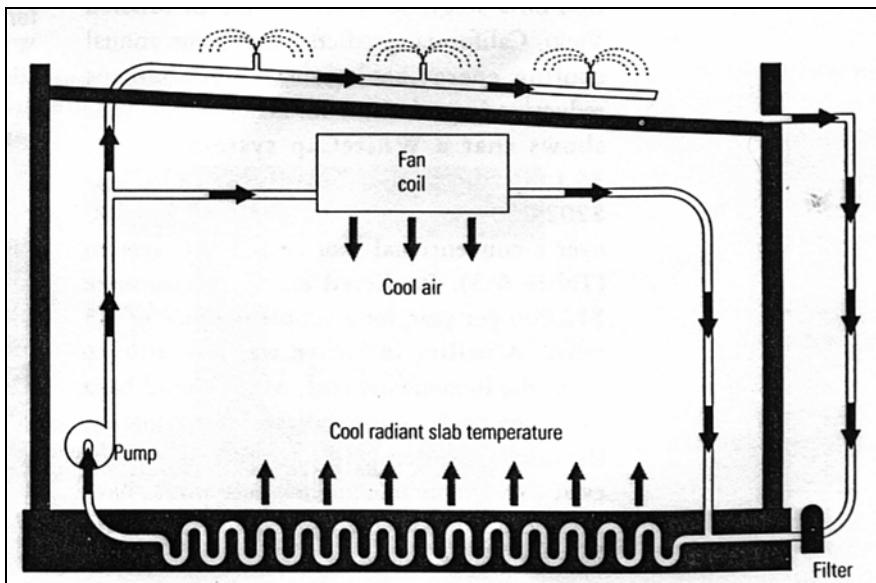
Night sprinkling of roof in order to cool floor slab. This system is called WhiteCabF (Cler et al., 1998).
